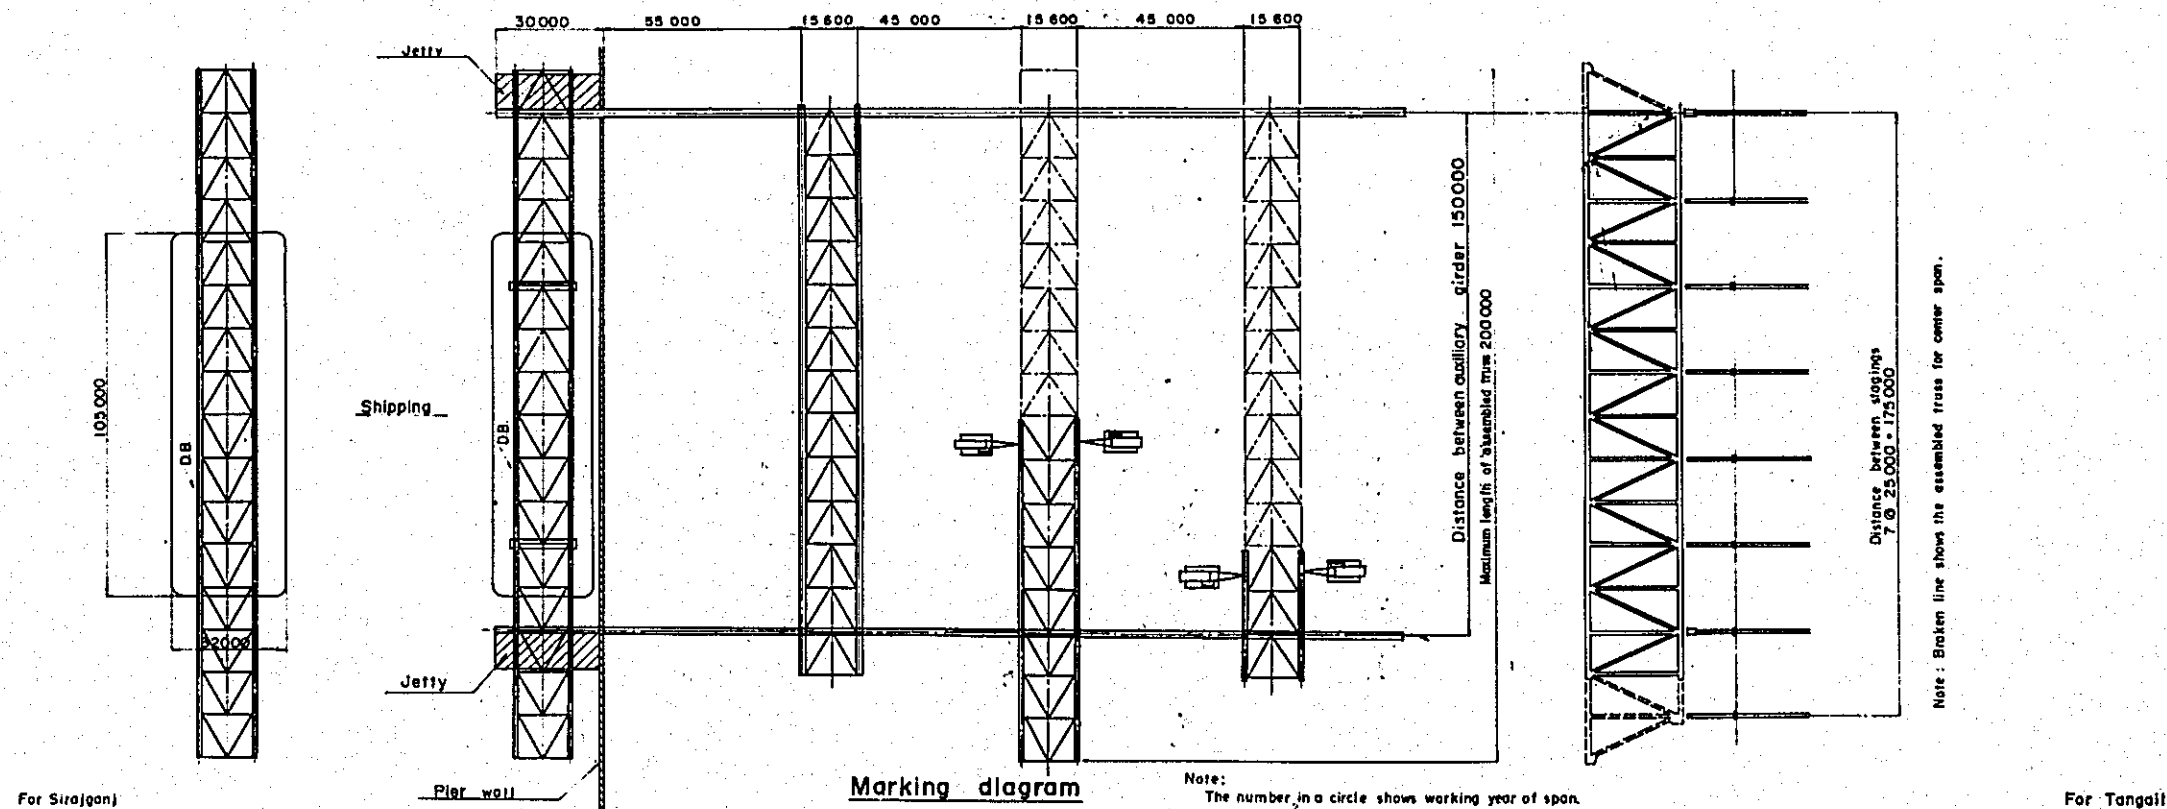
Erection of Truss at Yard and Shipping Diagram.
